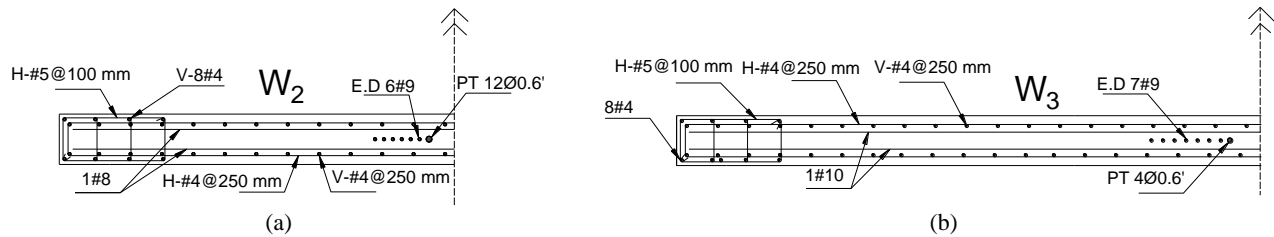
Reinforcement schemes: (a) W_2 plan view, (b) W_3 plan view.
